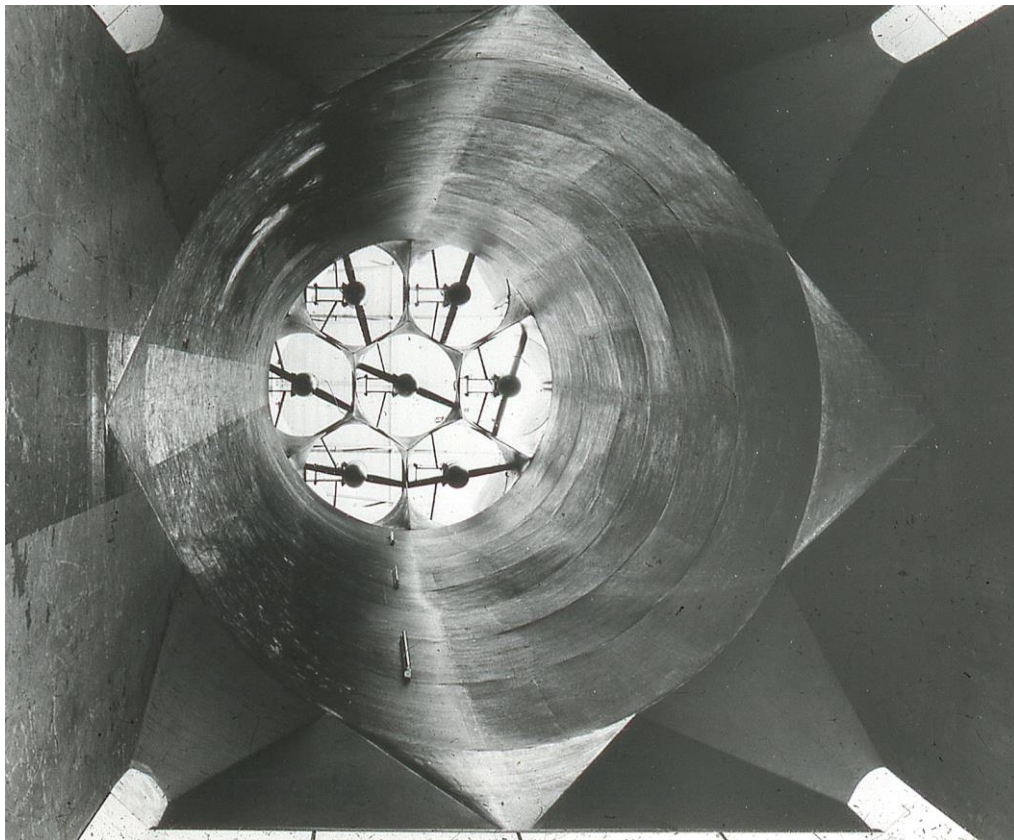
The steel structure of the V/STOL tunnel diffuser looking towards the fan section. Photo taken during construction
